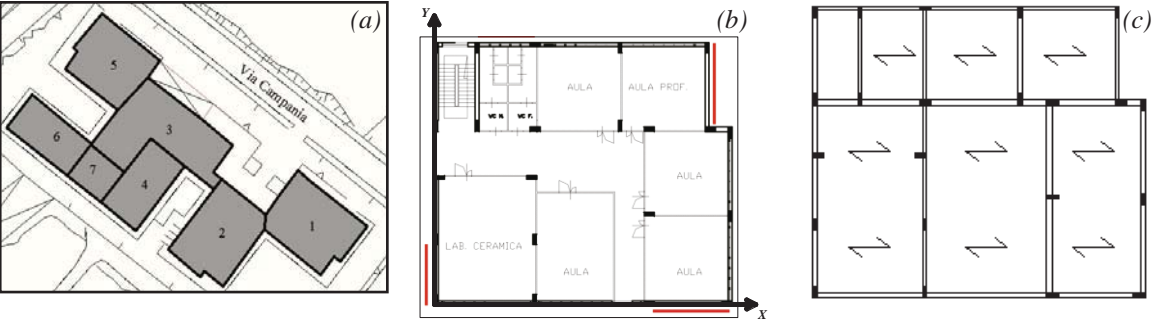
The school complex “D’Assisi” (a) and the structural unit under investigation: the architectural layout (b) and the structural scheme (c).
